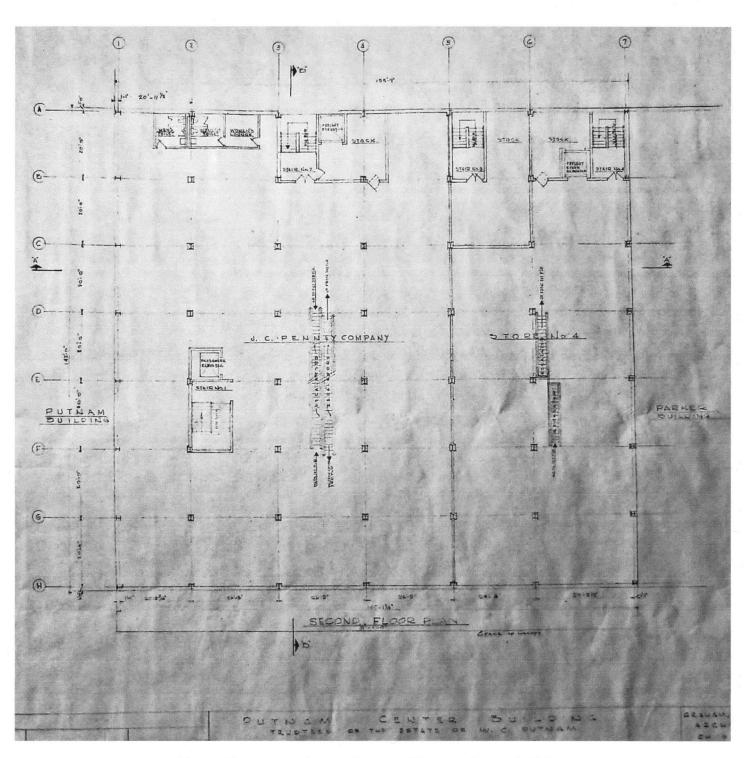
Layout of second story of Putnam Center Building (Putnam Trust collection, unprocessed drawings).
